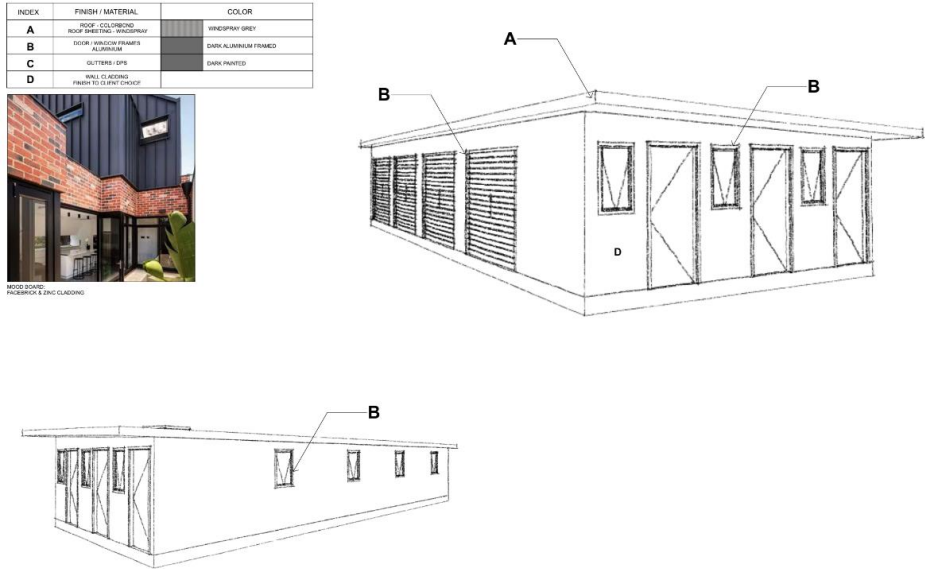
Sketch and proposed materials and finishes for new garage structure (Source: The Plan Show, Drawing No. DR-4395, Sheet 10, 02.08.23)
